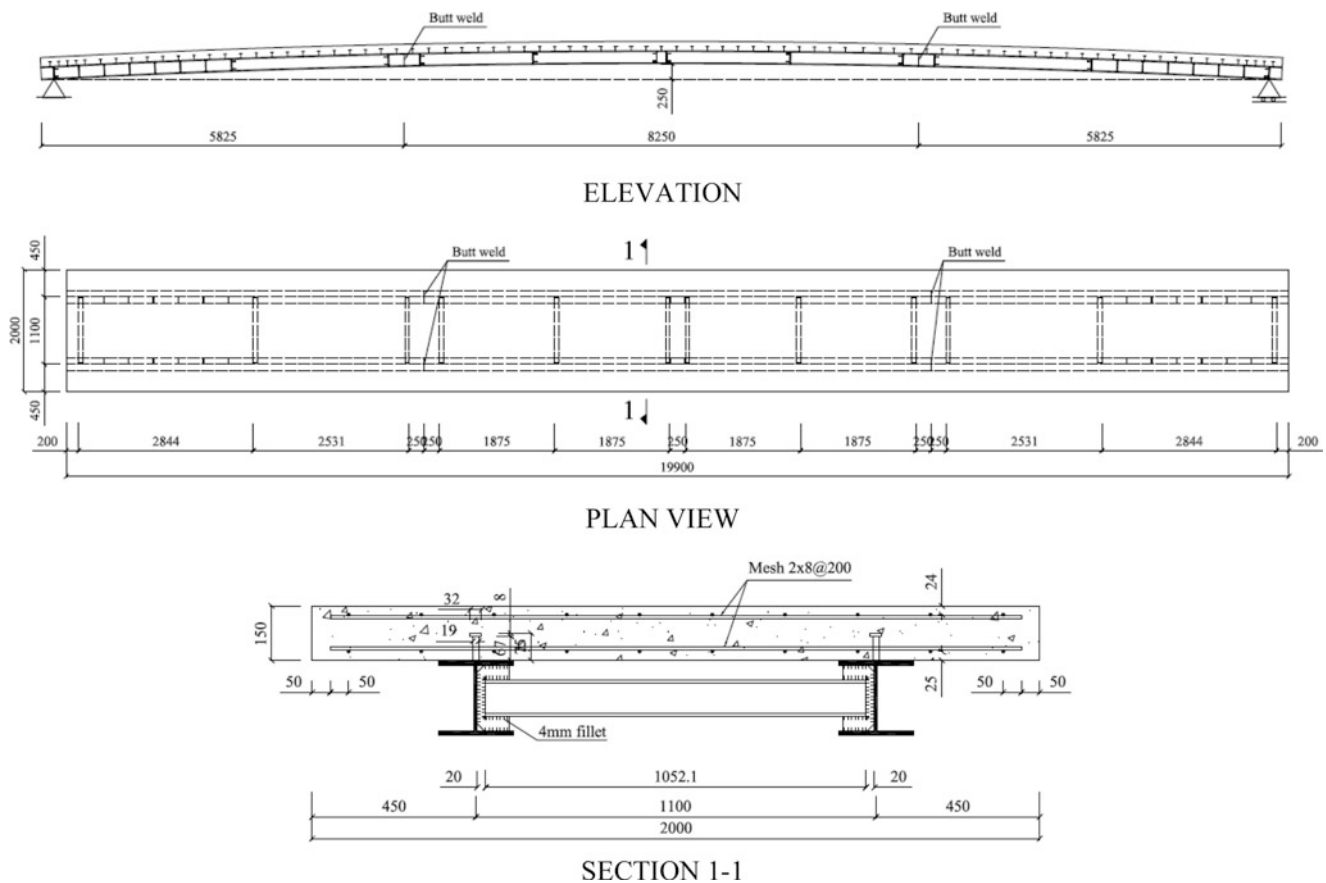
Elevation, plan view and cross section of the Warwick Bridge
